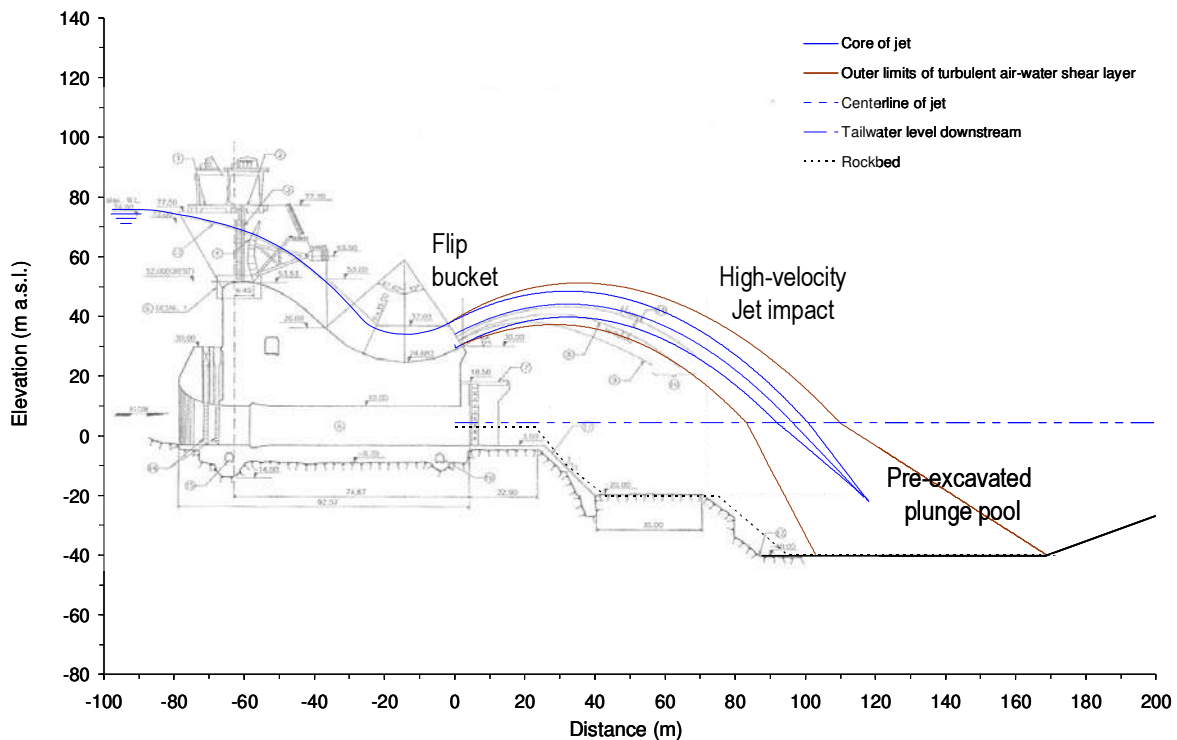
Cross-sectional view of spillway and pre-excavated plunge pool.
